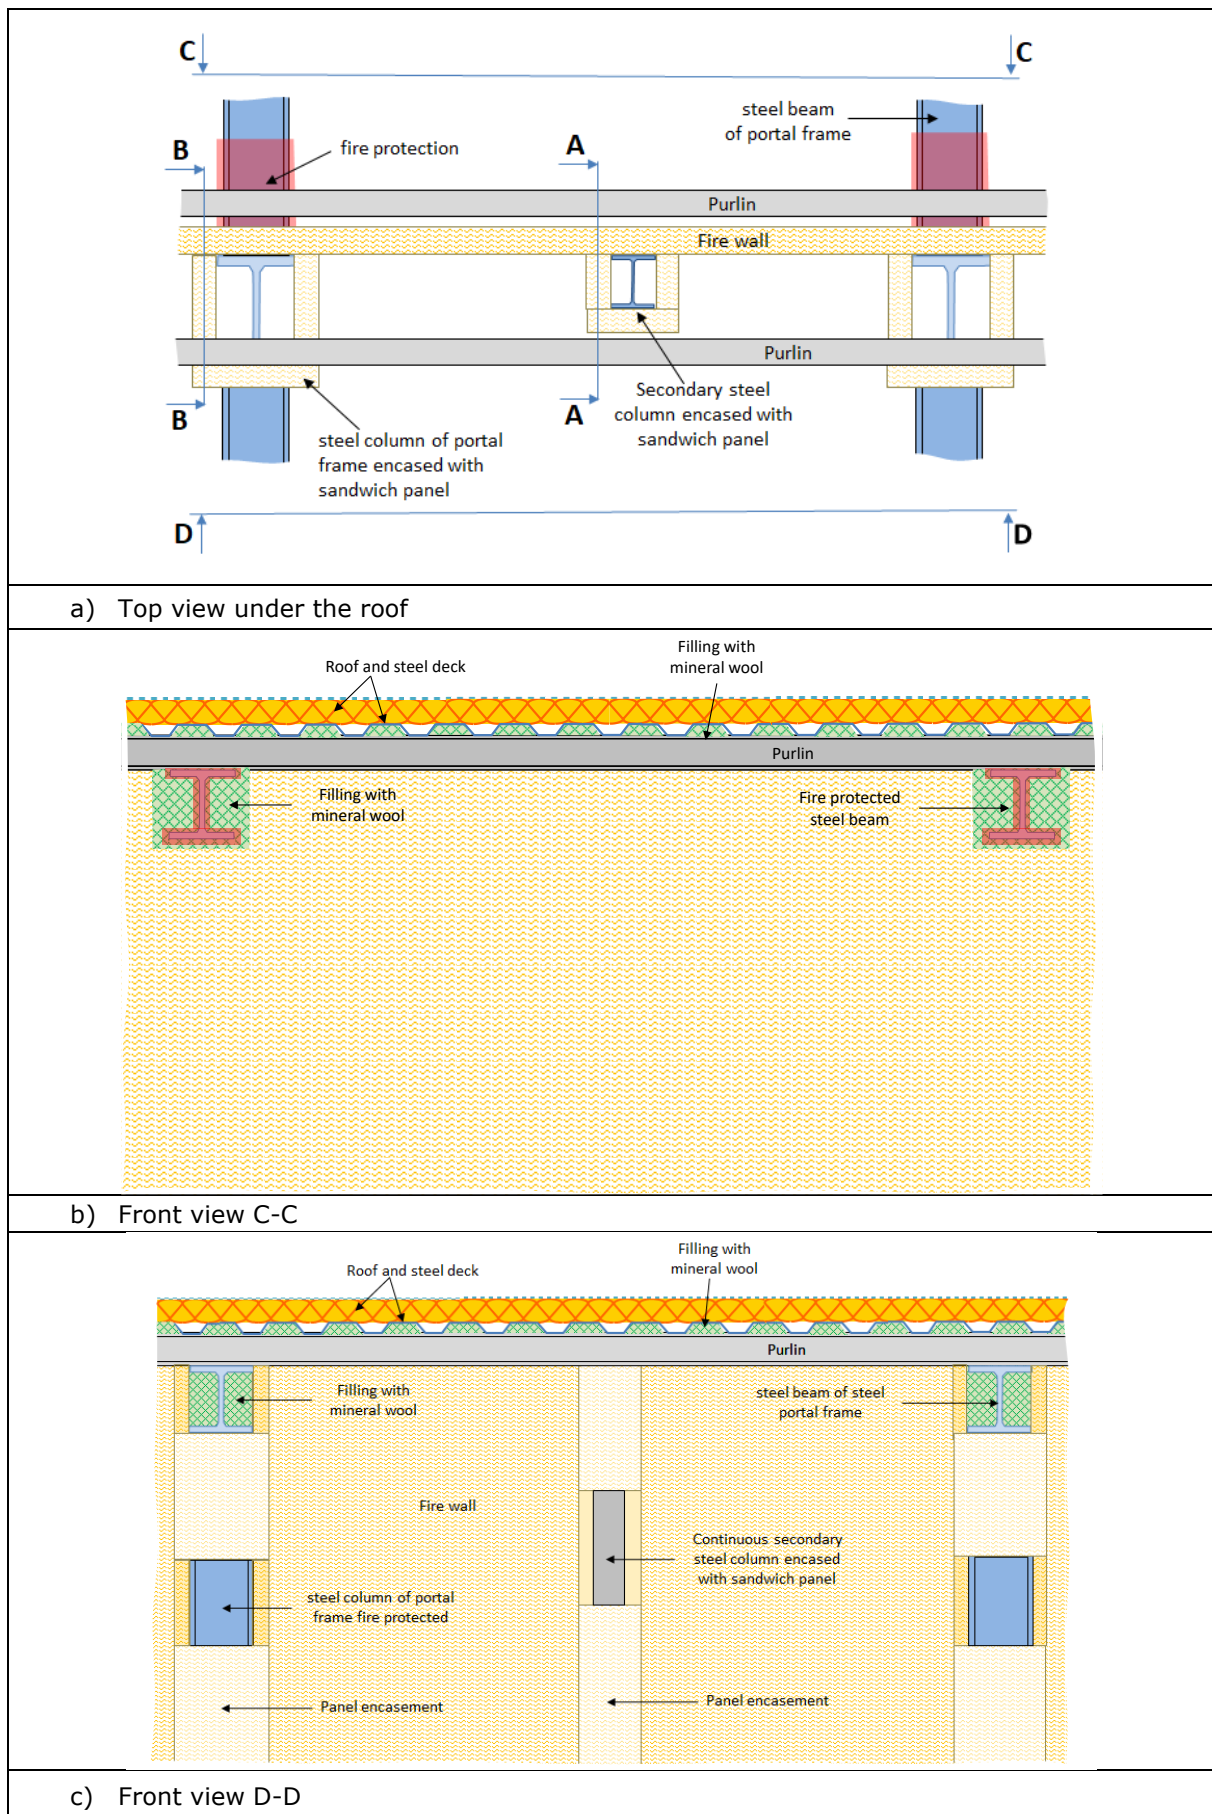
Schematic views for a fire wall perpendicular to portal frames, inserted into a row of columns and not extending until the roof – Portal frame columns with panel encasement system
